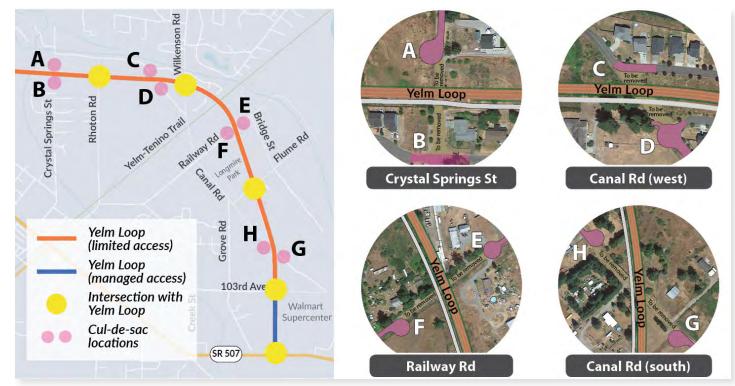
New Cul-de-Sac Locations and Configurations
